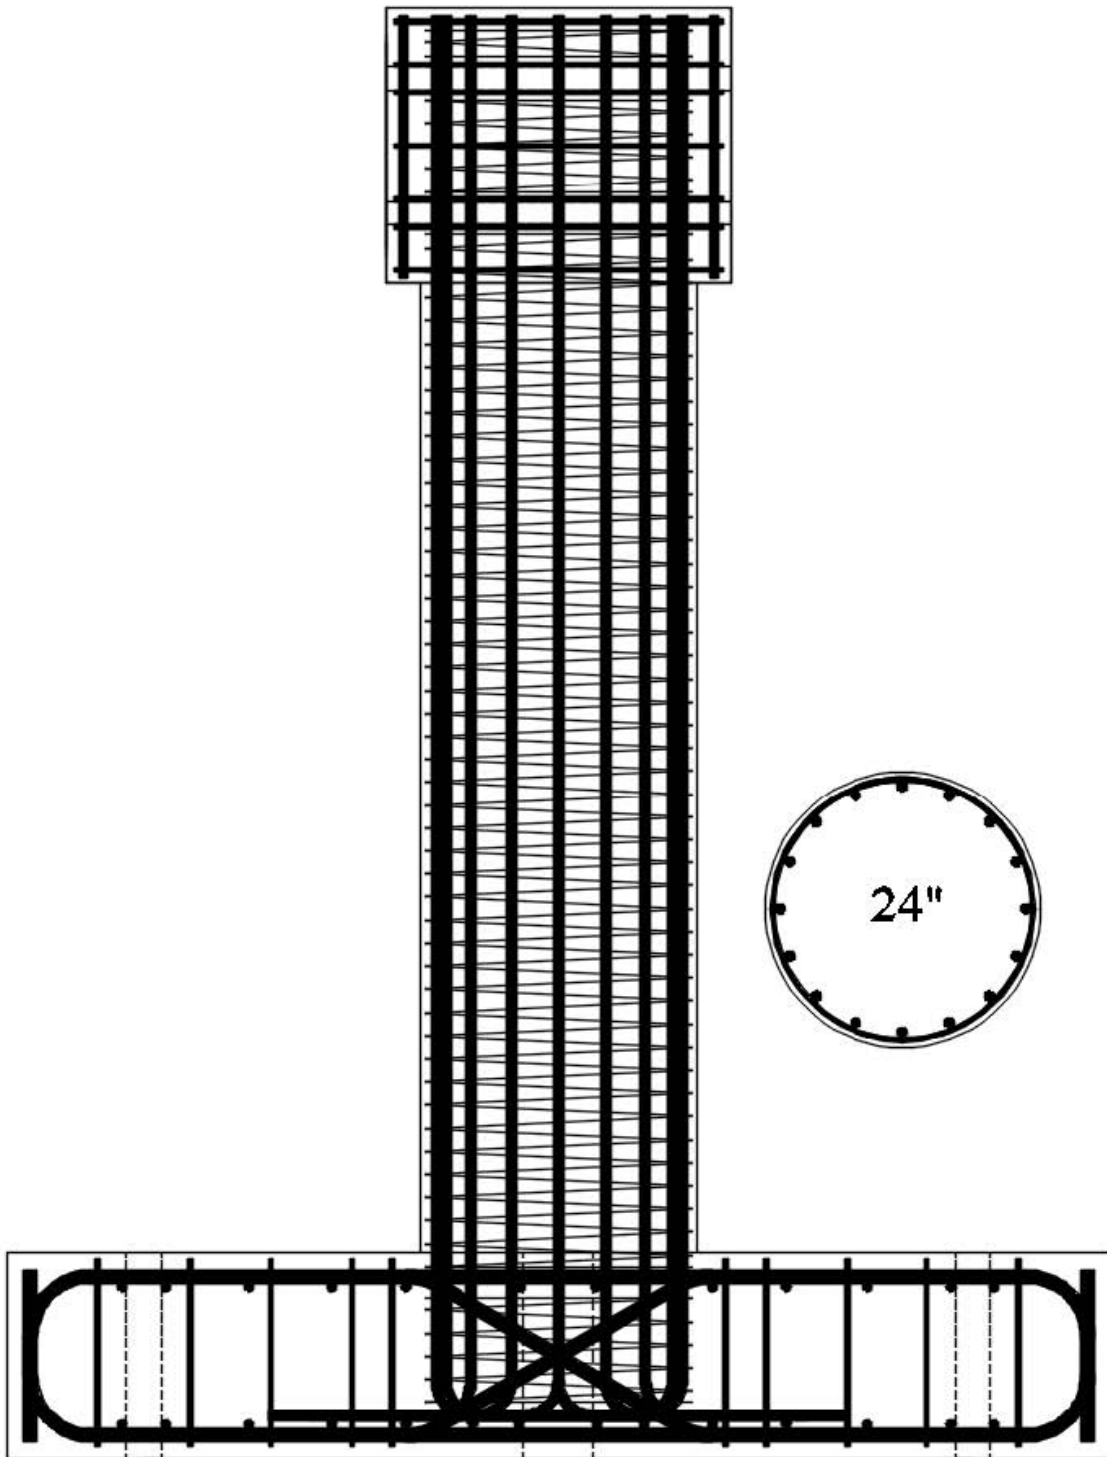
General Reinforcement Details for 24" Diameter Specimens
